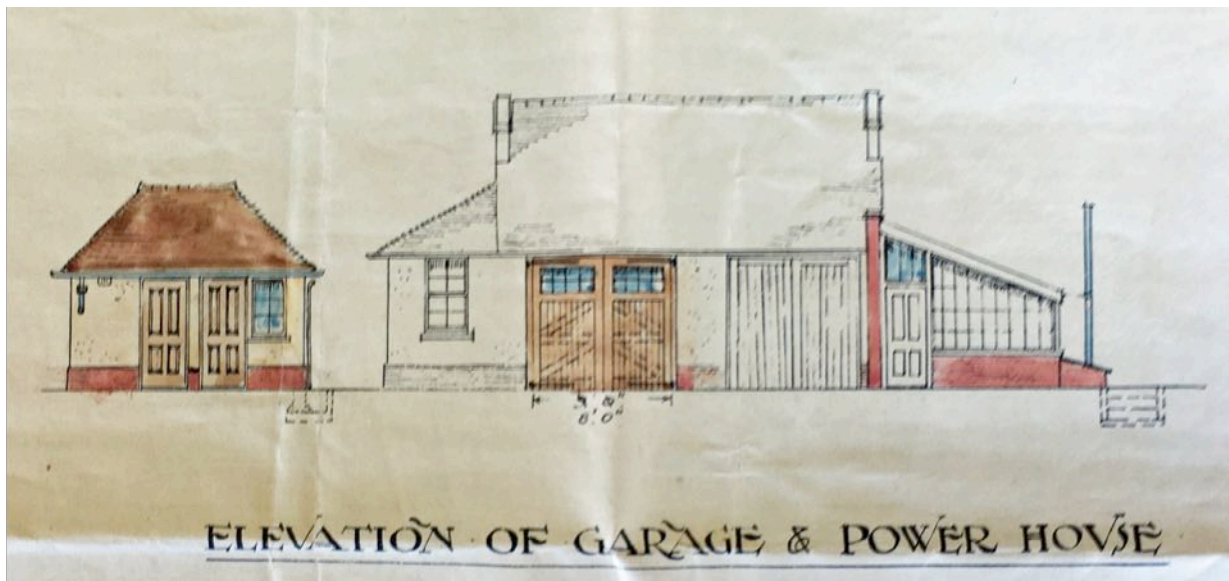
Detail of The Hollies power room, from the 1921 planning application.
